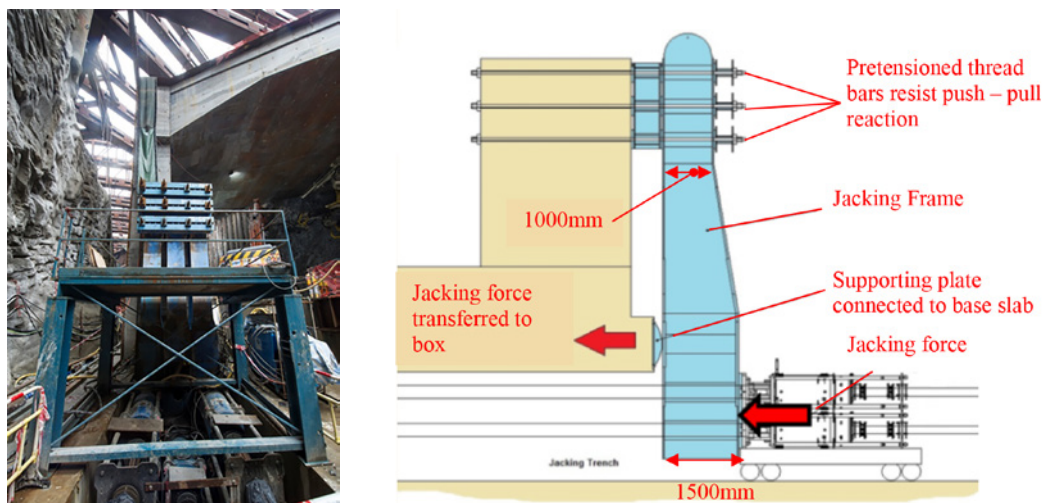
Typical Trench Details with Pull Jacking System Showing 5No. x 800 tonne VSL Strand Jacks.
